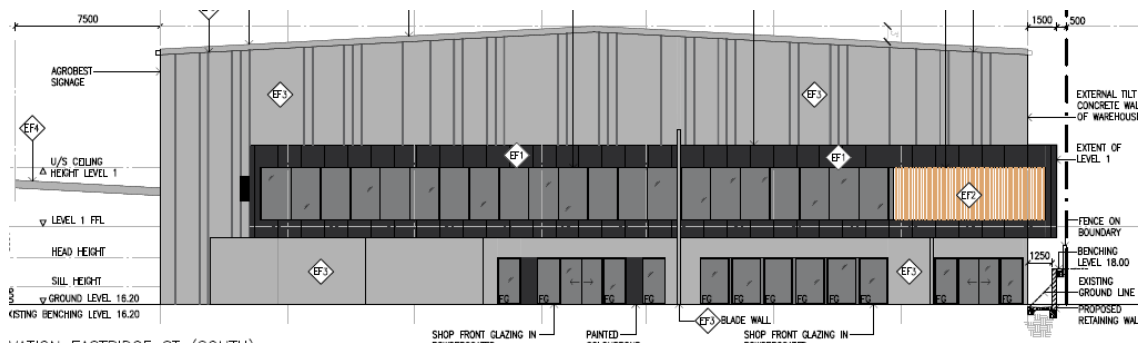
Proposed South Elevation (Source: Architects Dovey & Associates)
